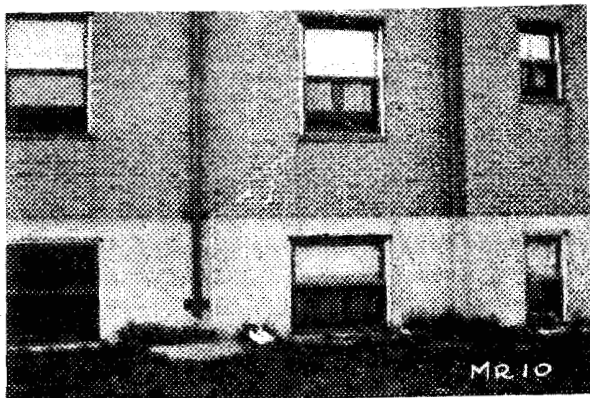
Crack in foundation and diagonal crack in supported brickwork.
